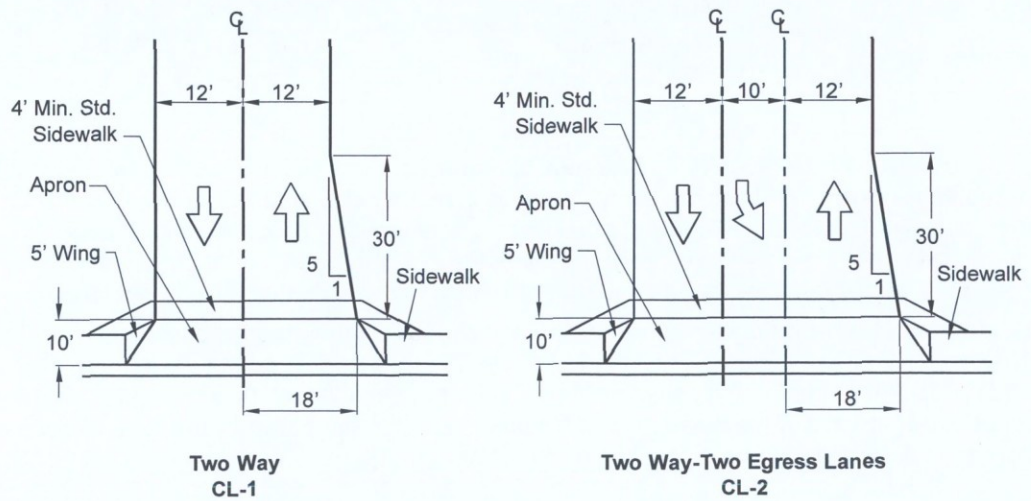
TYPE CL TWO WAY DRIVEWAYS
